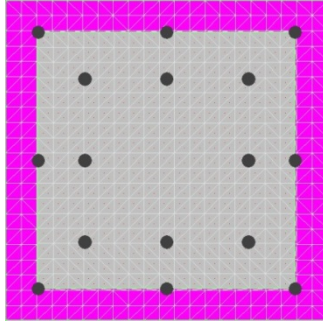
HSRC Jacketed Column 5A13 Cross Sectional Detail
